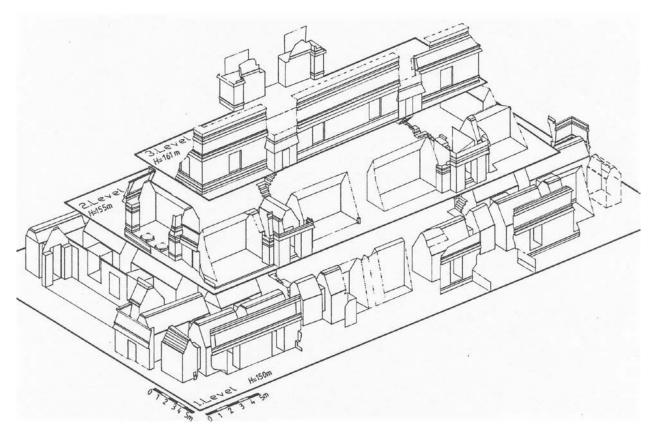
Axonometric view from north-west, showing rooms, stairwais and facades of the different leves
